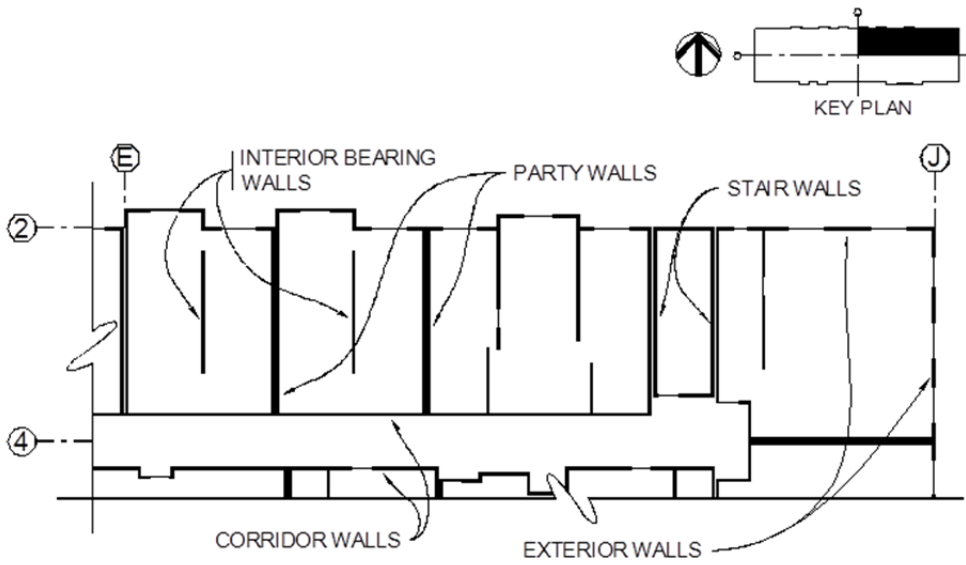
Plan of shear walls (northeast corner) for wind design.
